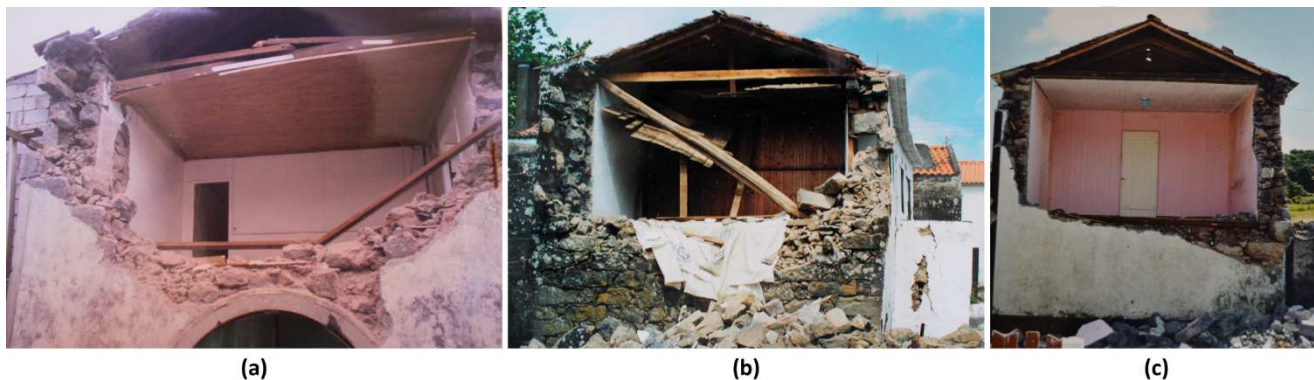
Examples of collapsed buildings showing deficient wall-to-wall connections
